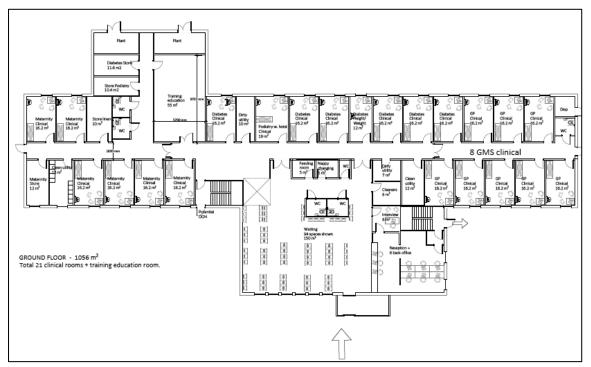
King's Lynn – proposed Hub Ground Floor Plan
